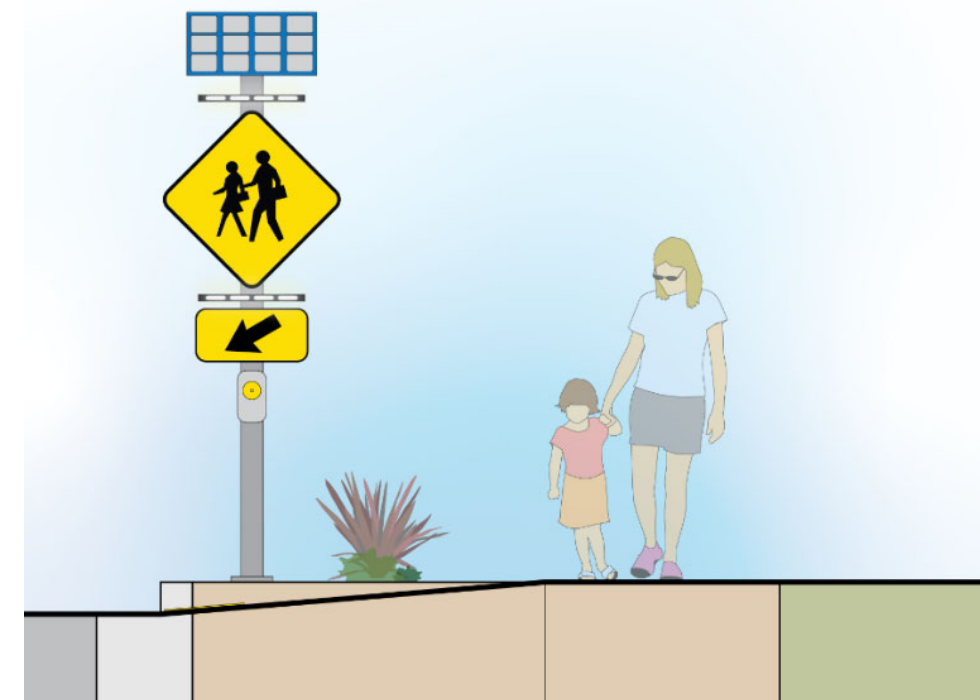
RECTANGULAR RAPID FLASHING BEACON SECTION VIEW
